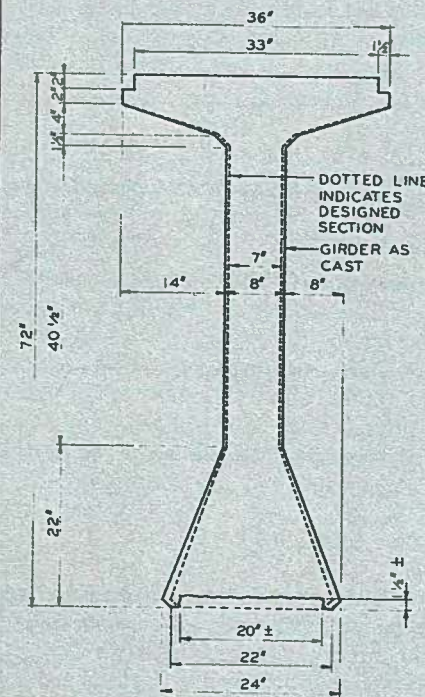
Cross section of oversized girder with spalled soffit.
